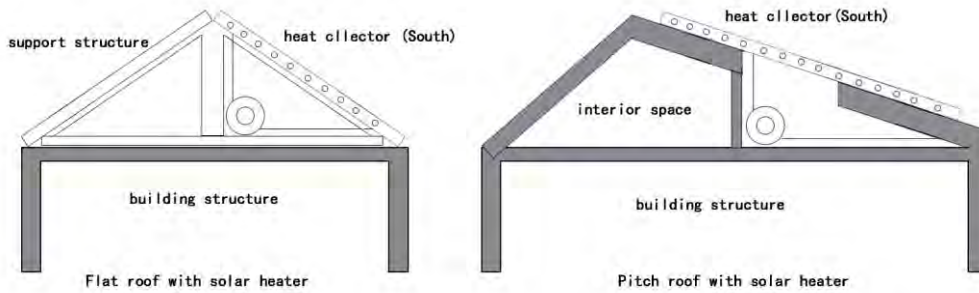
Sketch drawing of integrating solar heater on the roof of residential building
